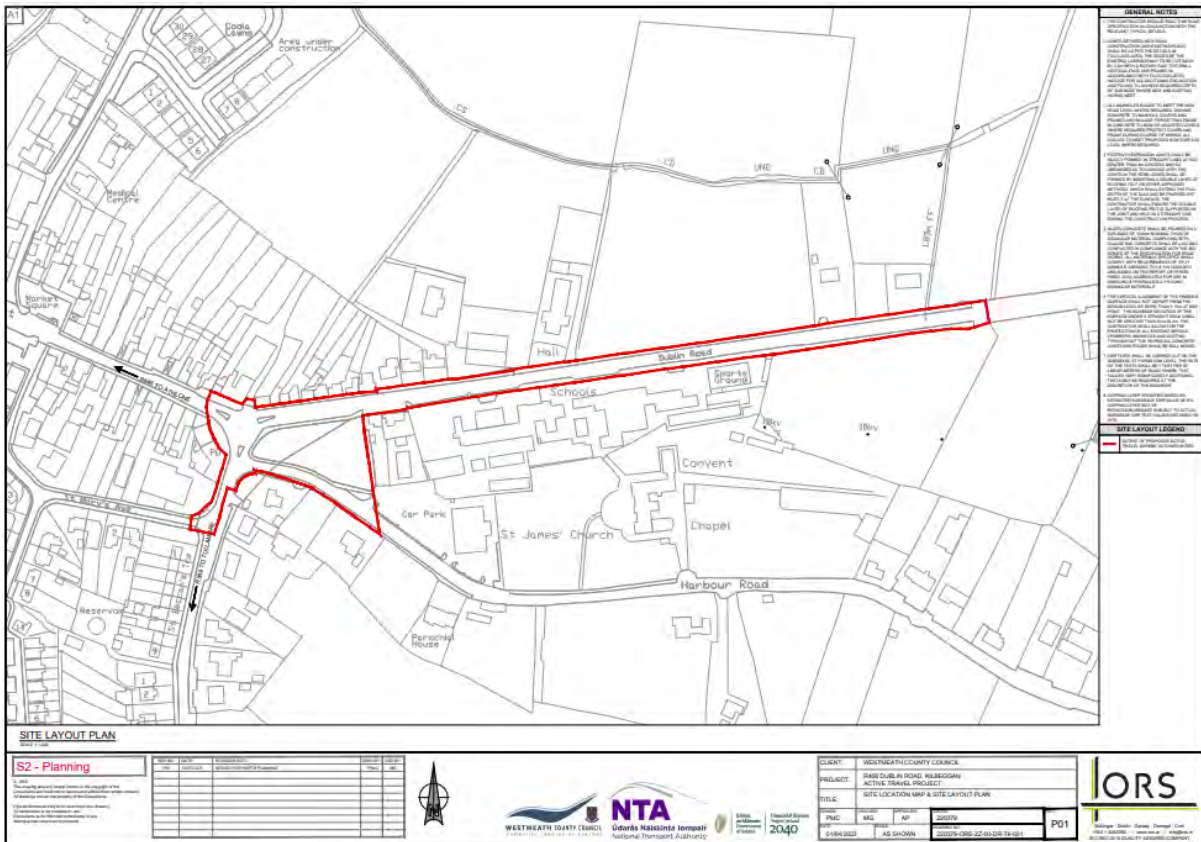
Site Outline of the proposed development, located on the R446 (Dublin Rd) and R389 (Tullamore Road), Kilbeggan, Co. Westmeath,
